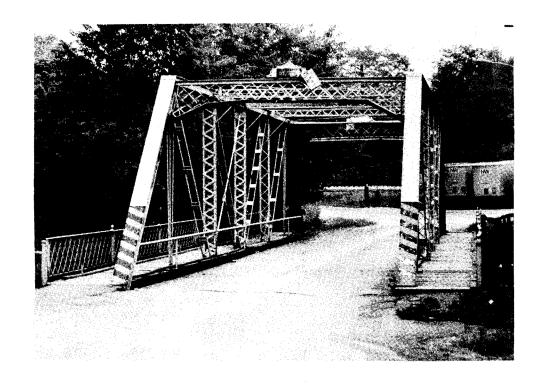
King Iron Bridge Company Pratt truss with bridge plate intact, built in 1885.
